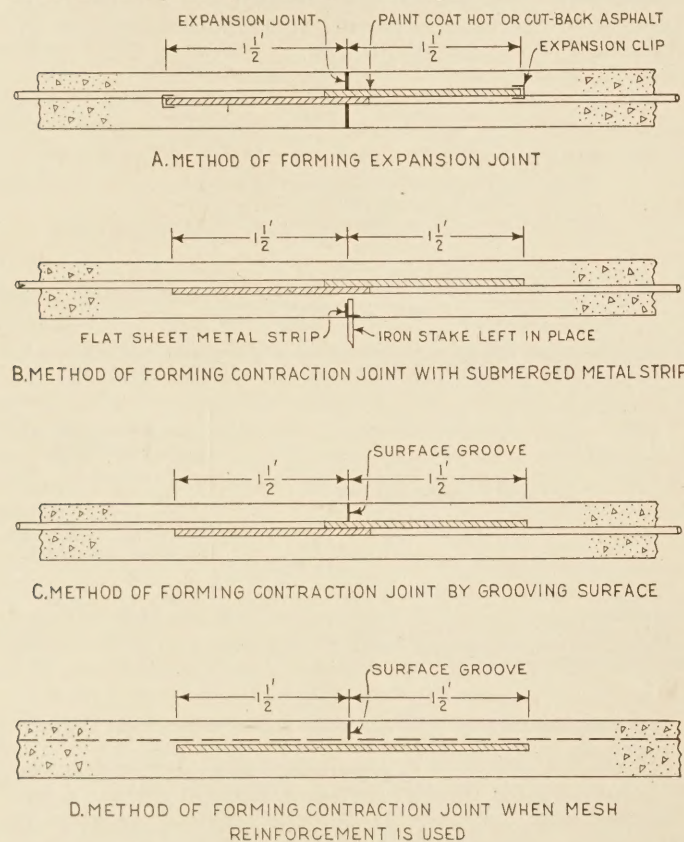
Methods proposed for forming joints in steel reinforcement and reinforced concrete pavements. The methods permit the contraction of the concrete without rupturing the steel
